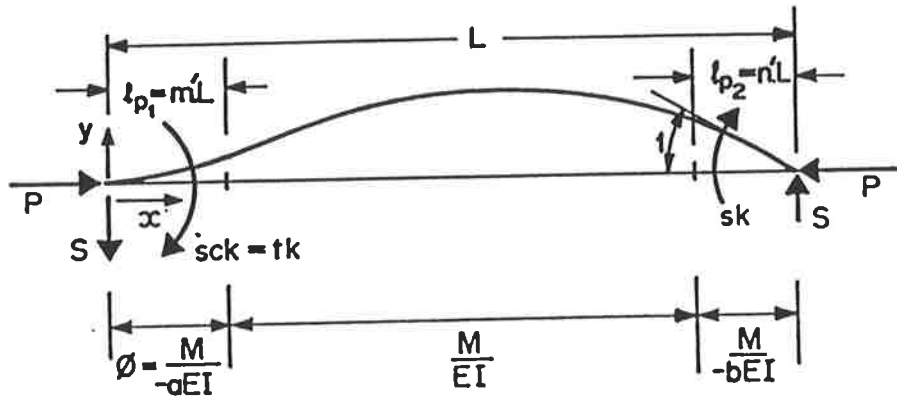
Beam with concrete hinges (Mendis and Darvall,1987)
